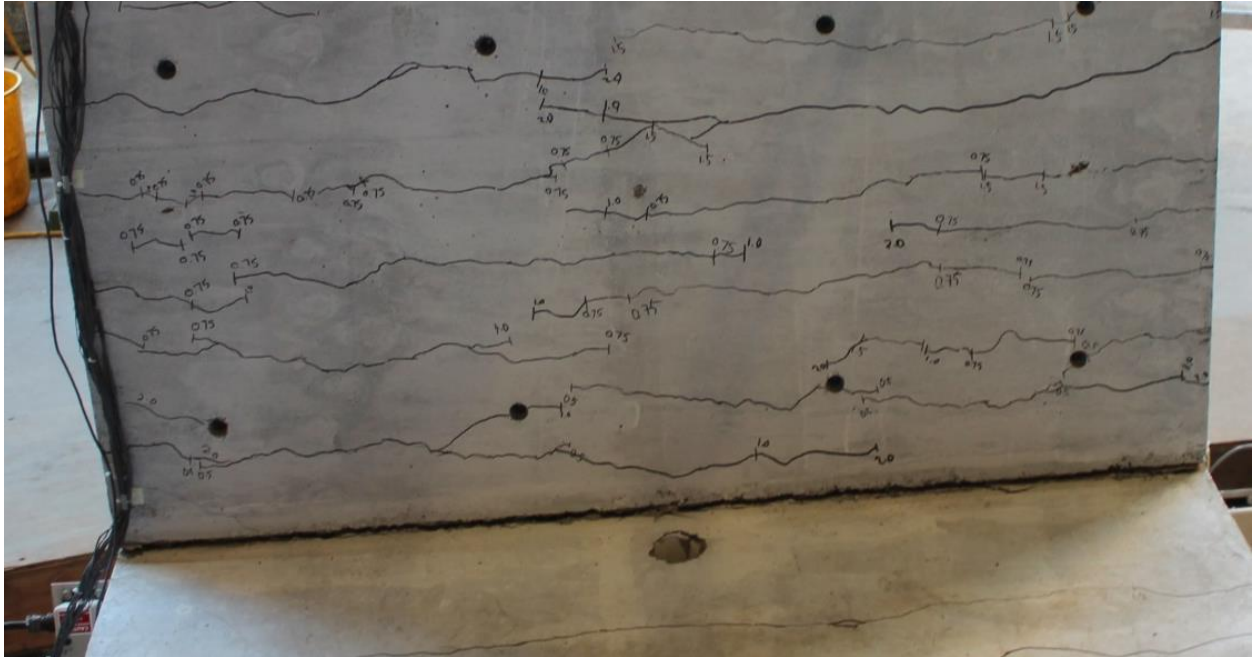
Flexural cracks at base/north wall interface during positive extension at 6.0% drift ratio (Cycle 23-24). Picture of inside North wall at base looking North.
